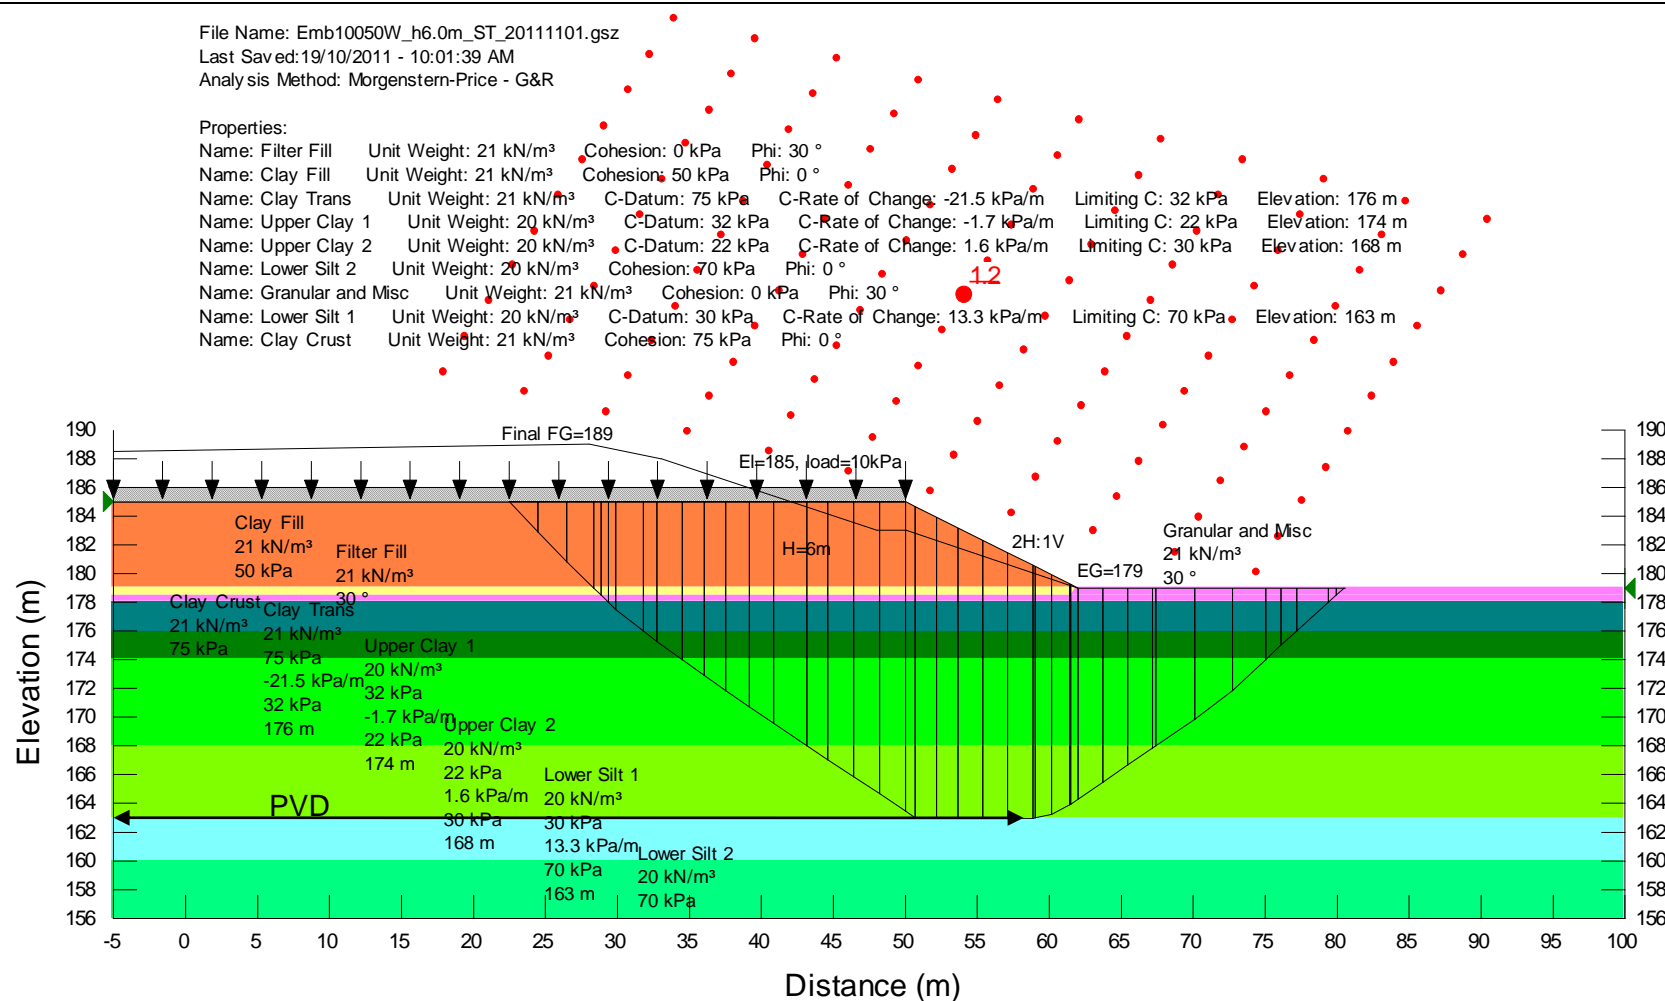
Slope Stability Result – Section 1 (Sta. 10+050W) – Stage 2 (El=187.5) – Short-term Loading
